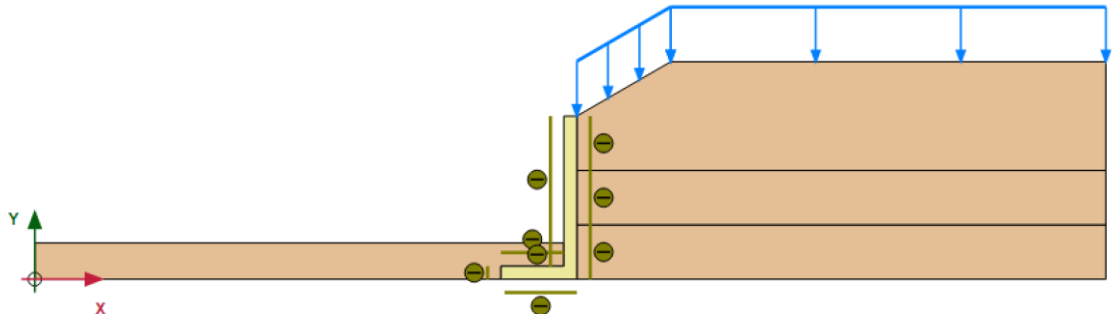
Retaining wall with backfill slope 30° and no TDA backfill
